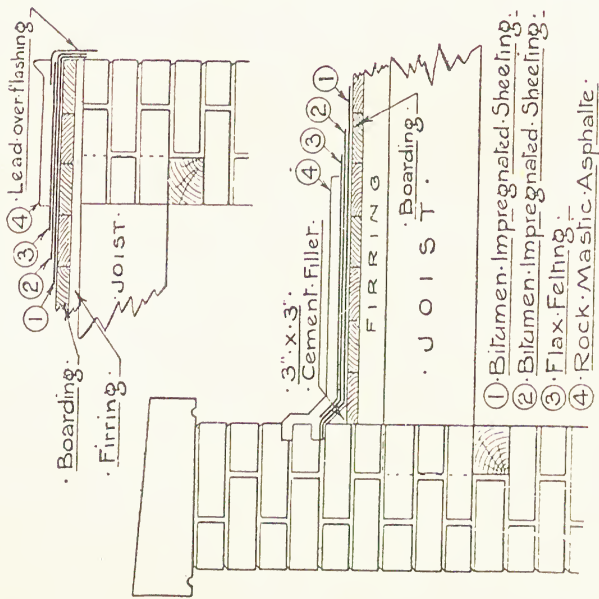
Details of asphalt roofing on boards and on concrete, at parapets, eaves, and verges
